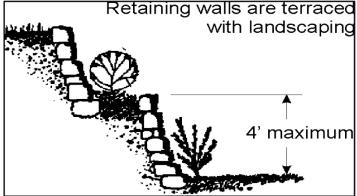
Recommended Retaining Wall Materials any retaining wall. To the greatest extent feasible, rockeries shall be located
